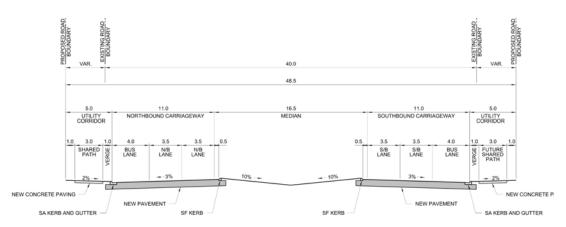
The proposed works - typical cross section between Mersey Road and Adams Road (source: Jacobs 2016)
